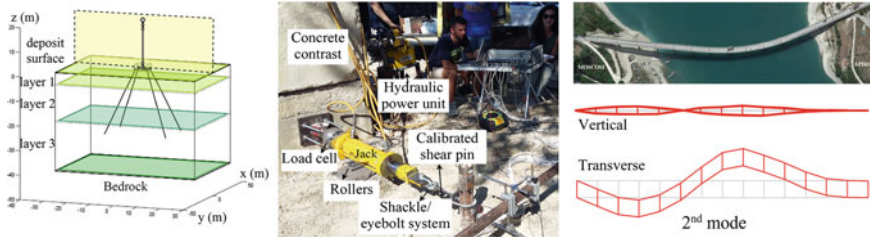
Numerical studies on bridge piers, experimental set-up on micropile foundations and dynamic identification of a multispan prestressed concrete bridge
